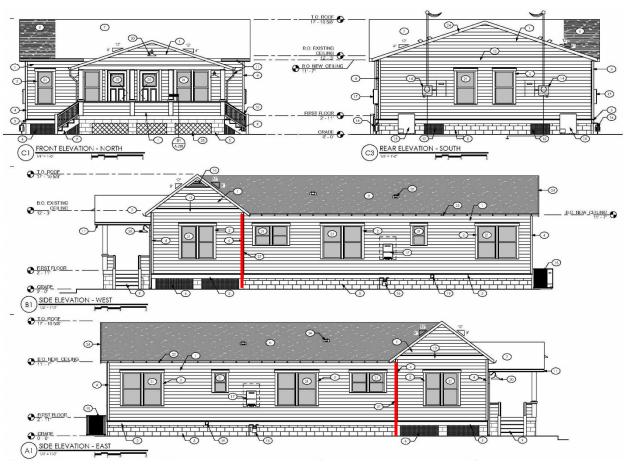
Proposed elevations of rehabilitated duplex with rear addition. Red line denotes separation between the original structure and the new addition.
